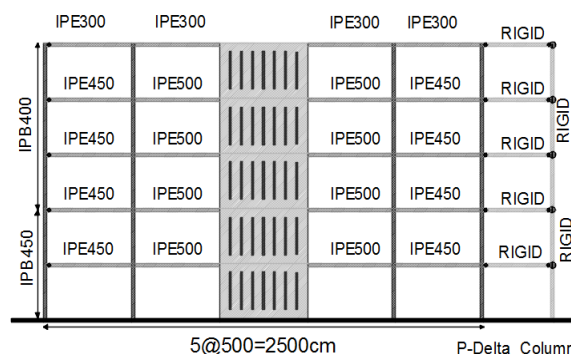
5- story steel moment-resisting frame with RC slit shear wall besides P-Δ column
